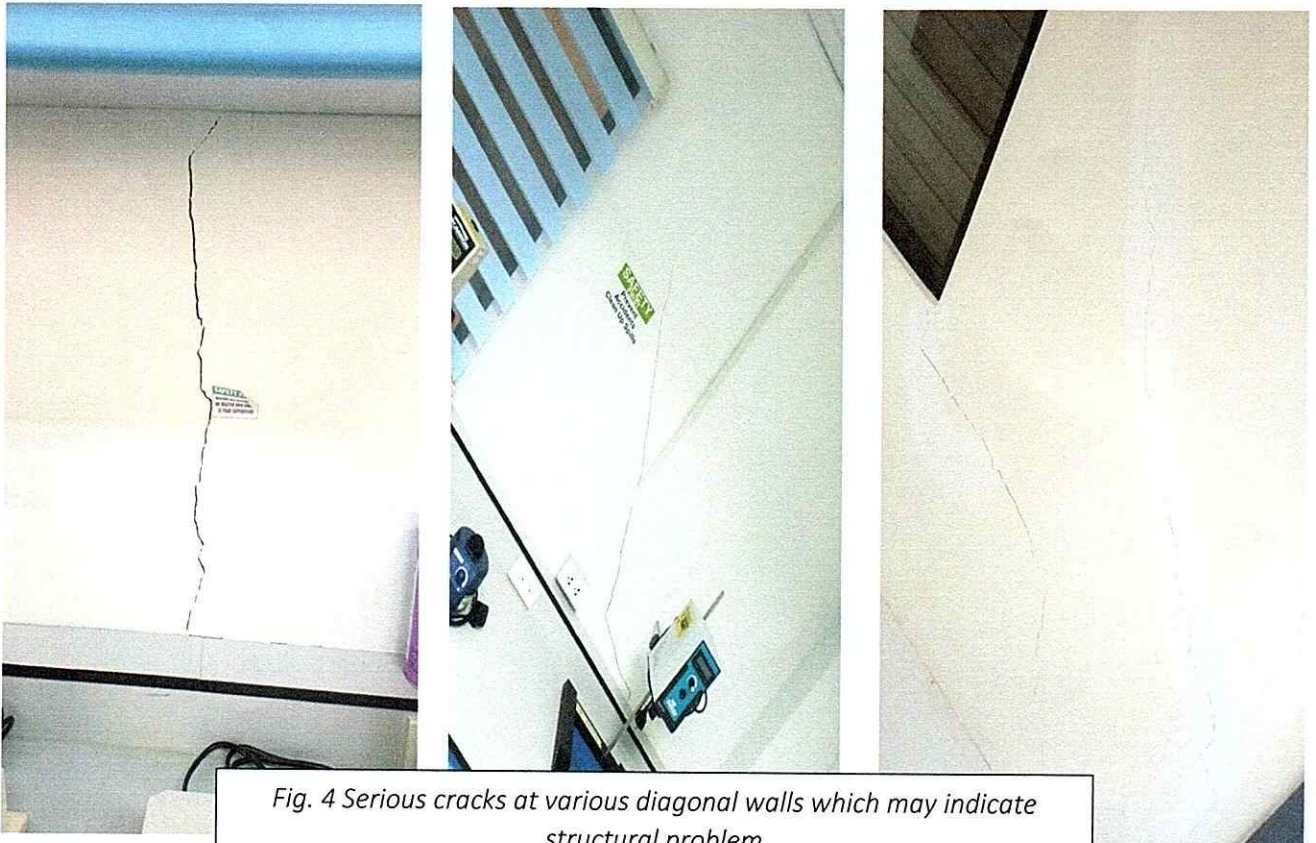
Serious cracks at various diagonal walls which may indicate structural problem
